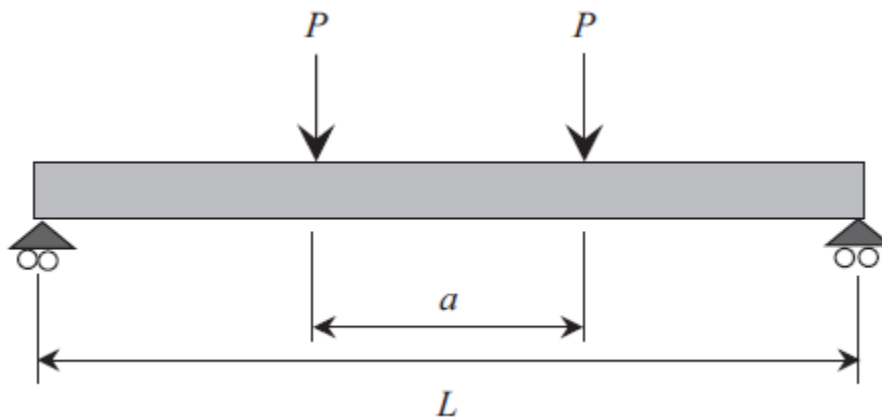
Schematic of Beam Fatigue Testing on Asphalt Beam
